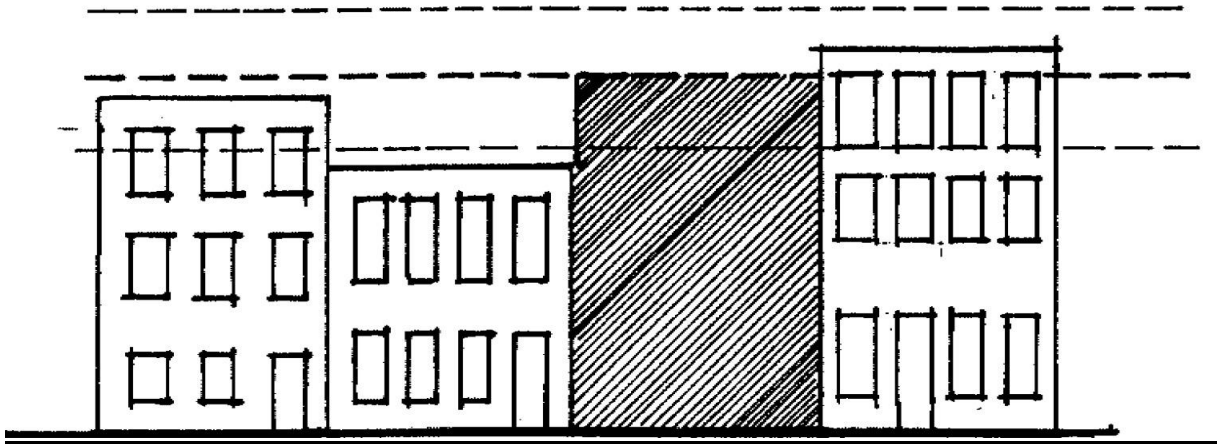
Schematic elevation sketch of a mixed-use “streetscape.” To create a visually unified “streetwall,” buildings should be no more than 30% taller or 30% shorter than the average building height on the block.
